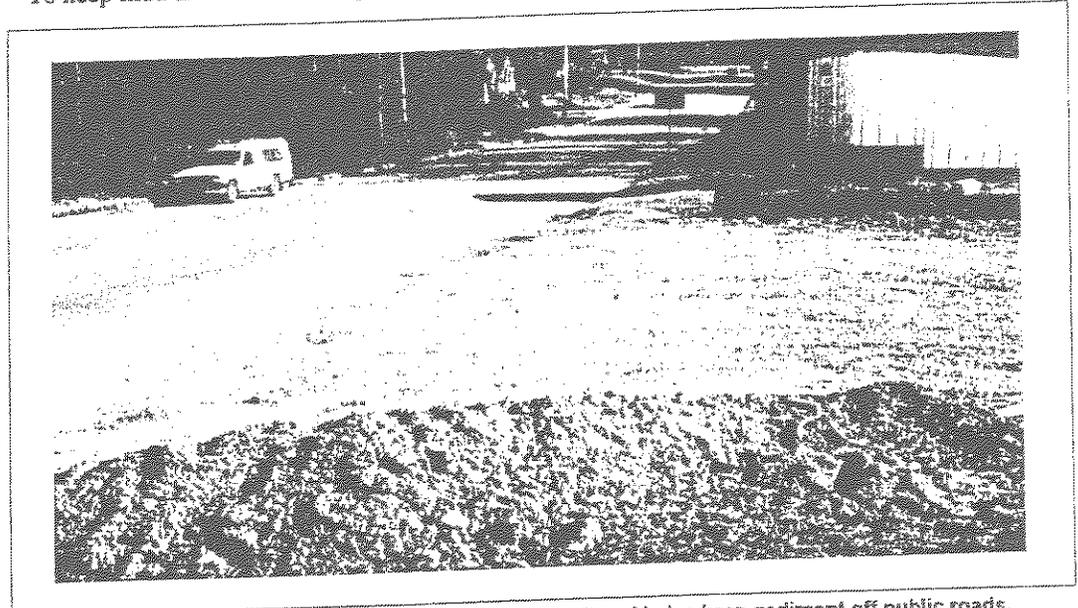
A. Temporary gravel construction entrance/exit pad helps keep sediment off public roads.
